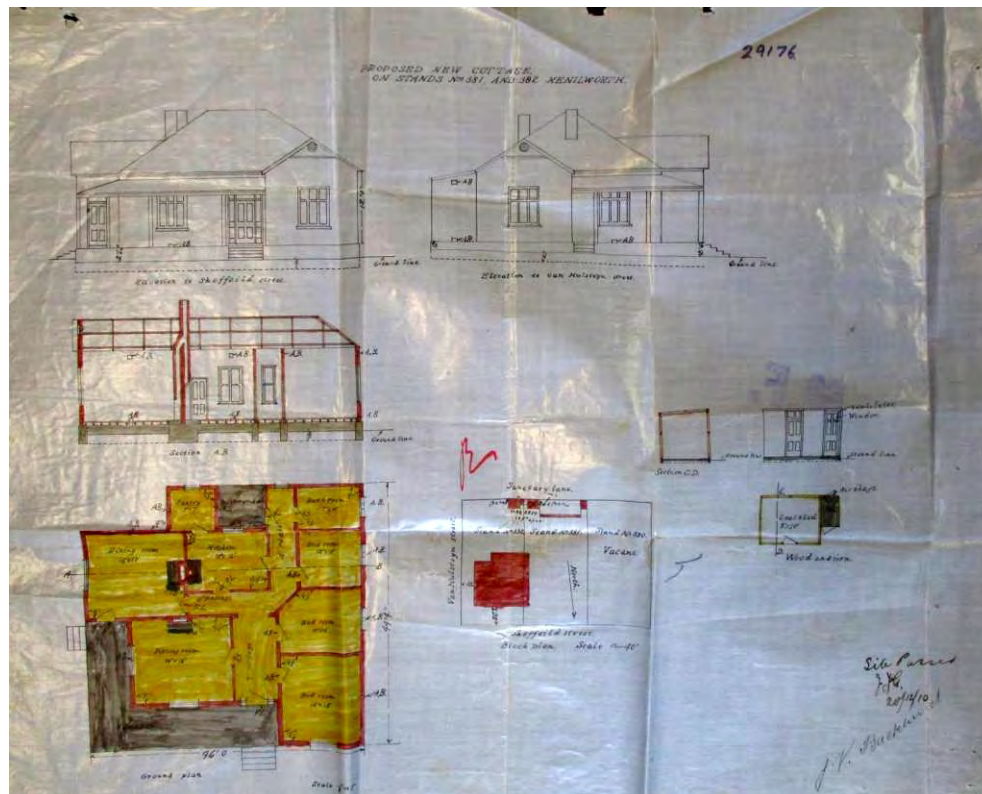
Proposed building which shows that there have been very little changes to date (Source: City of Johannesburg, Plans Archives)
